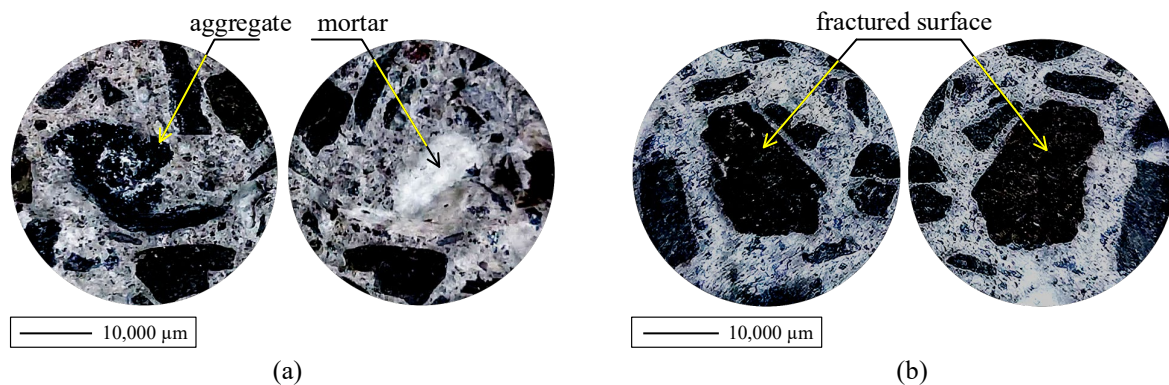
Specimen failure mode: (a) ITZ debonding; (b) Aggregate fracture
